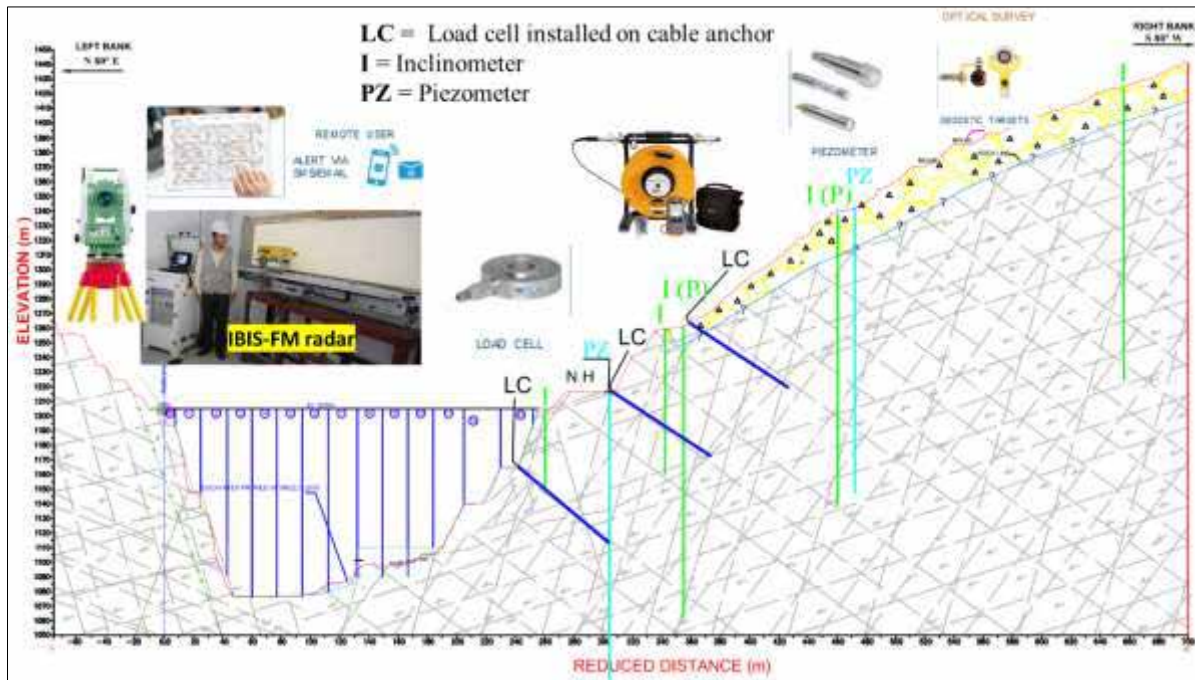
Typical cross-section of the right bank slope illustrating the approximate locations of surface and subsurface instruments installed for slope monitoring.
